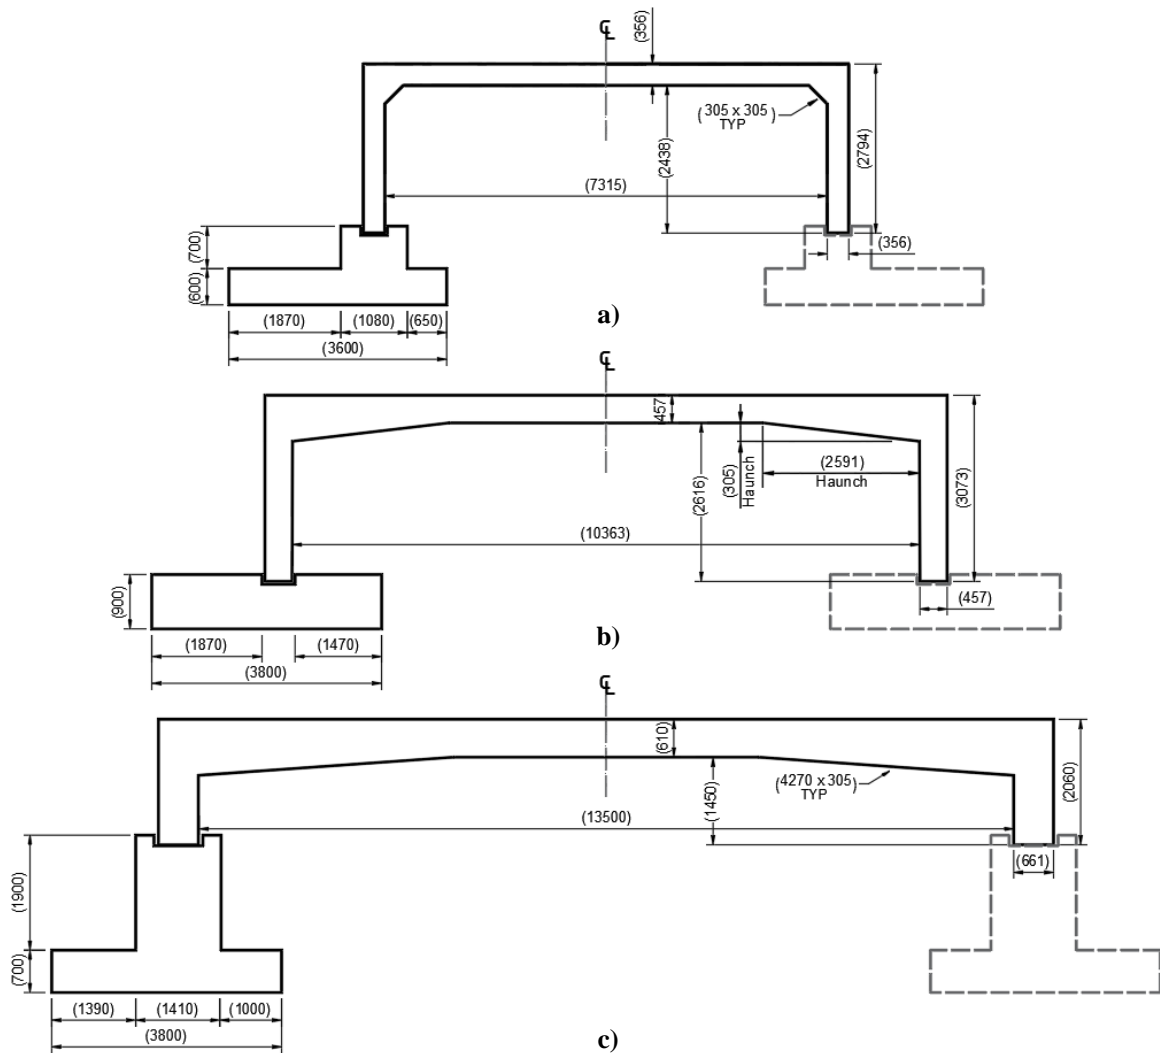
Geometry details of the studied TSCs and the supporting strip footings: a) Remembrance culvert; b) Pickering culvert; and c) Oshawa culvert. (All dimensions are in mm)
